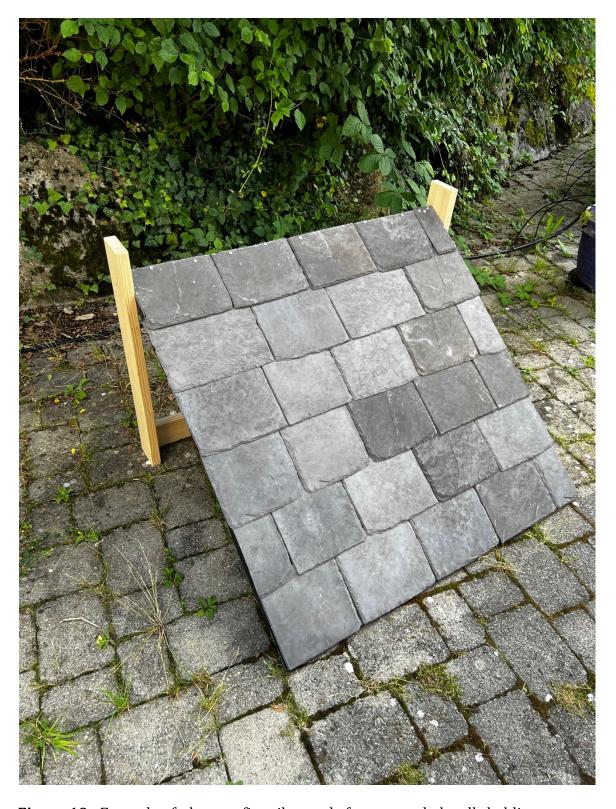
Example of slate roofing tiles made from extruded wall cladding.
